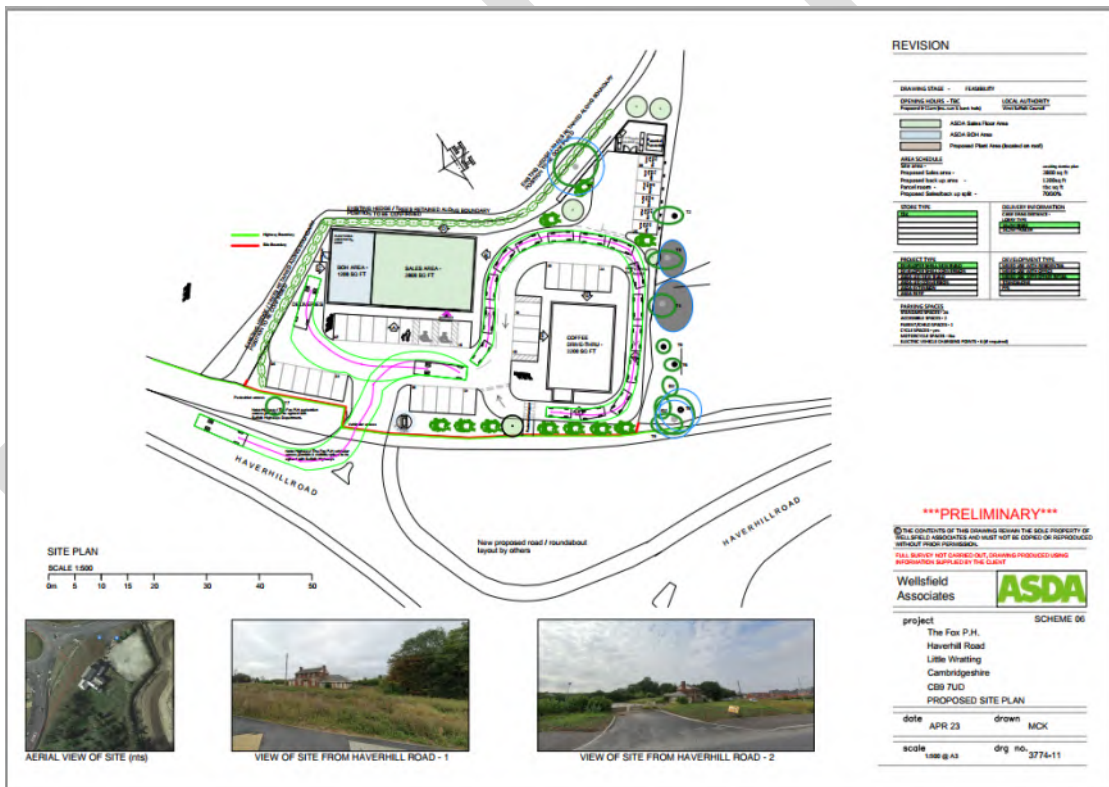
Proposed Site Plan (Drawing No. 3774--11)
